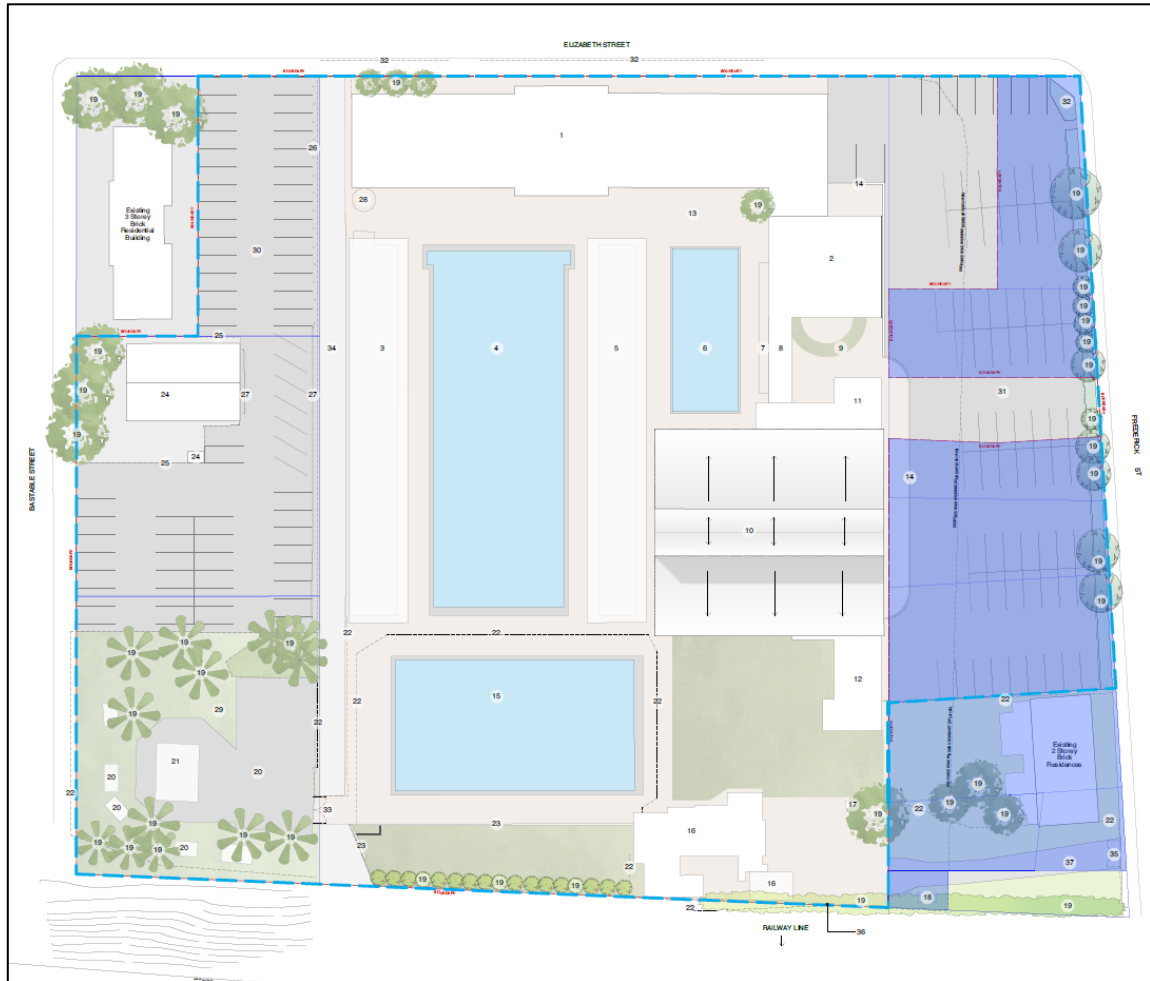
Existing site and location plan highlighting areas (blue) owned by RMS and Ausgrid
